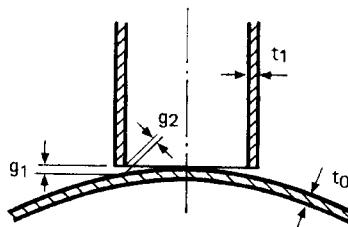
CHS joint with a single plane cut at the bracing end
